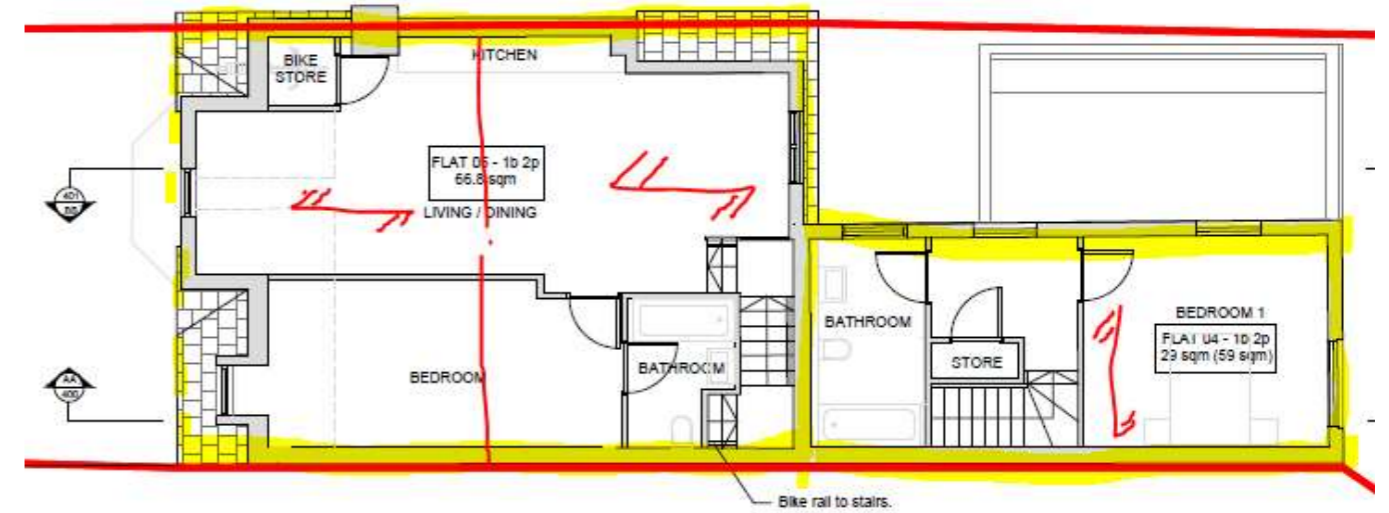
Assumed 2nd floor showing span of roof rafter over and steel beam.
